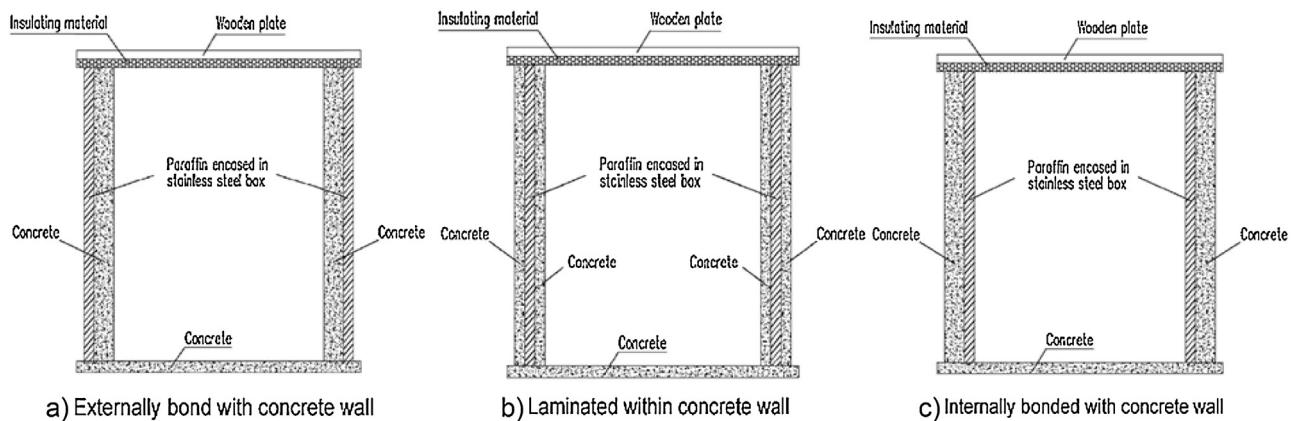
PCM layer: (a) externally bond with concrete wall, (b) laminated within concrete wall and (c) internally bonded with concrete wall [100].
